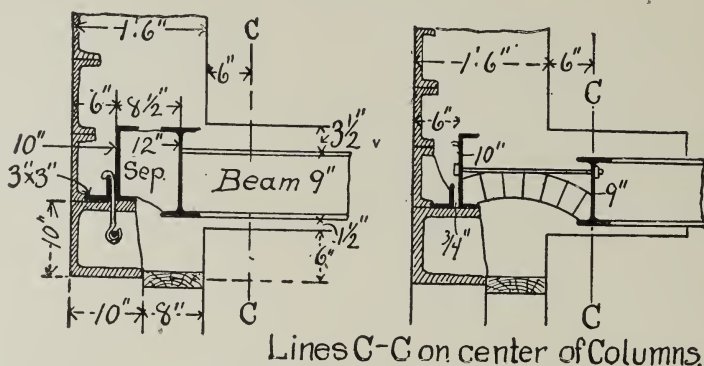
Spandrel Wall Supports. Champlain Building, Chicago.
